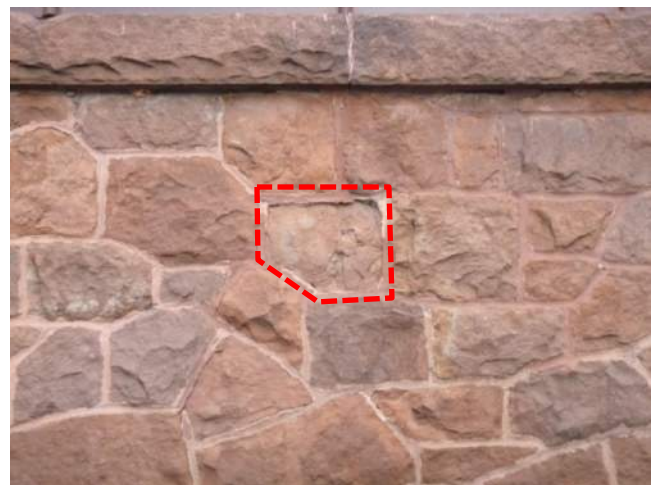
View of a spalled face of a sandstone unit and previous mortar repairs.
